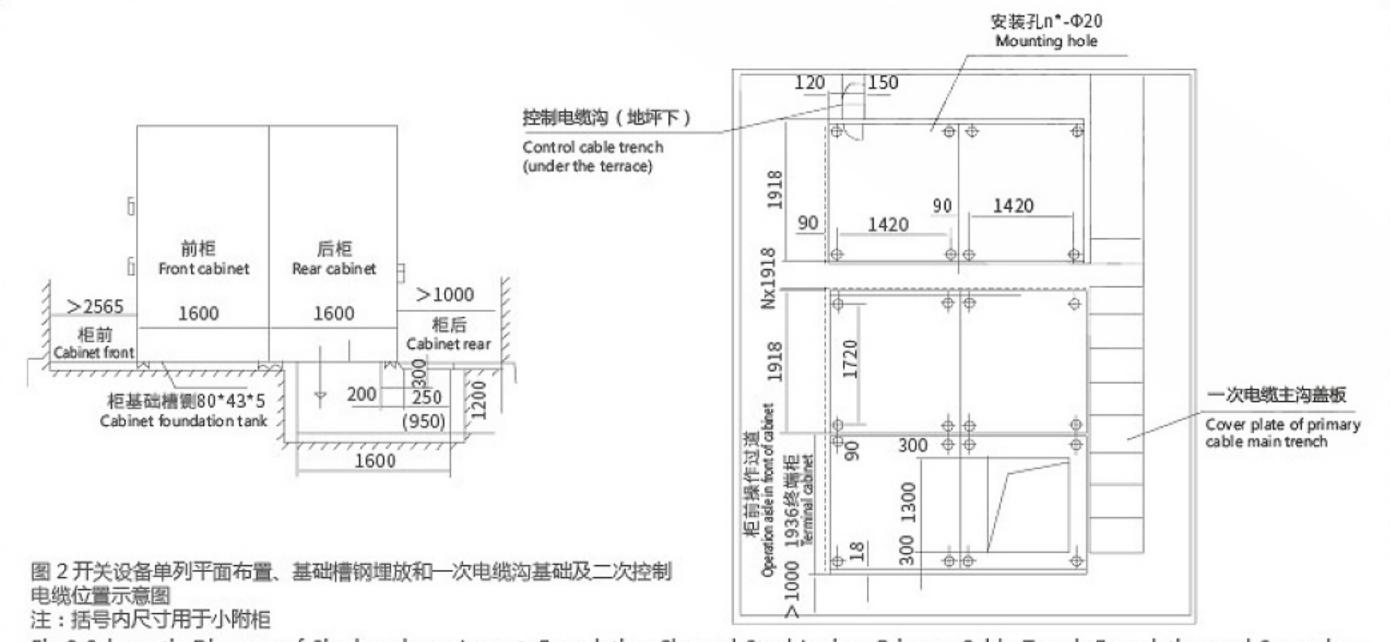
Schematic Diagram of Single column Layout, Foundation Channel Steel Laying, Primary Cable Trench Foundation and Secondary Control Cable Position of Switchgear Note: dimensions in brackets are used for small accessory cabinets
